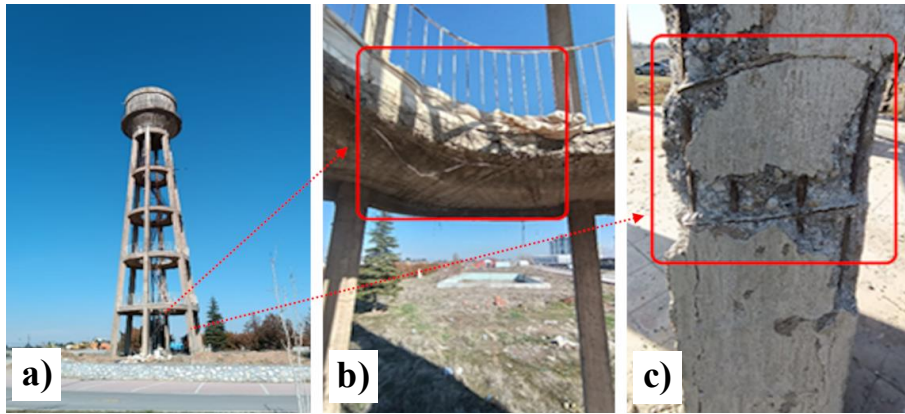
The RC elevated water tank damaged by the 6 February 2023 Kahramanmaraş earthquakes, a) general view, b) damaged ring beam, c) damaged column.
